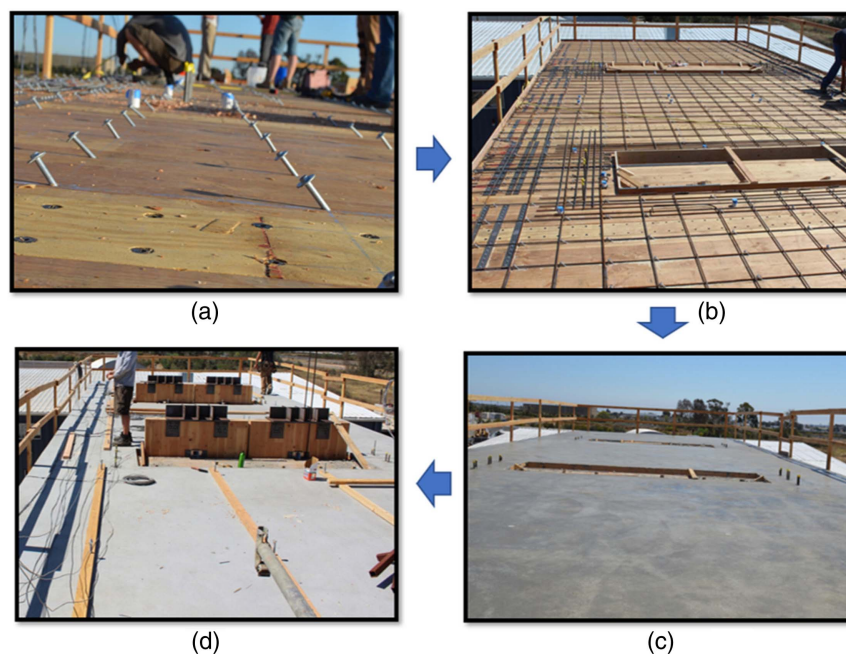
Construction of the wood-concrete composite roof diaphragm: (a) screw on CLT for shear transfer; (b) rebar for concrete layer; (c) newly poured concrete floor; and (d) completed roof with rocking walls in place.
